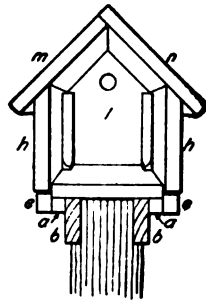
Cross section and interior view of front half of house for swallows and bluebirds.
